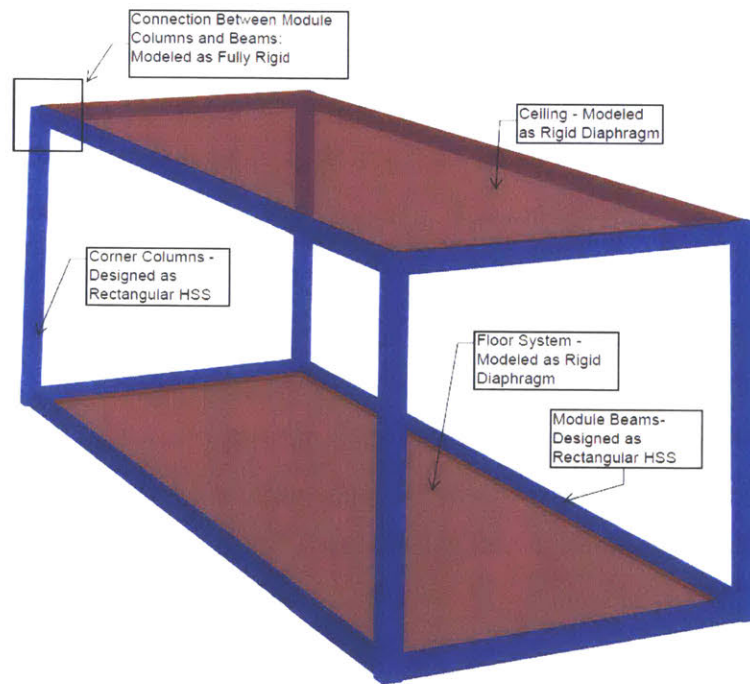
TYPICAL MODULE USED IN BUILDING PROTOTYPE
